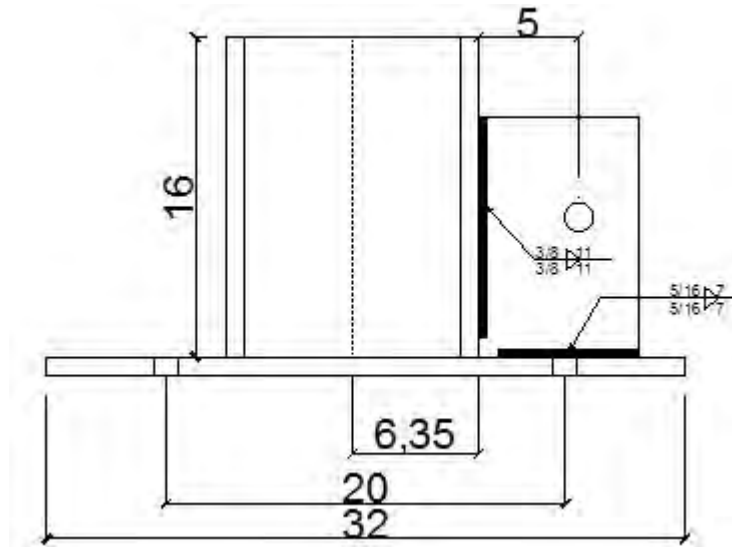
Weld design between the gusset plate, the steel W-section, and the base plate
